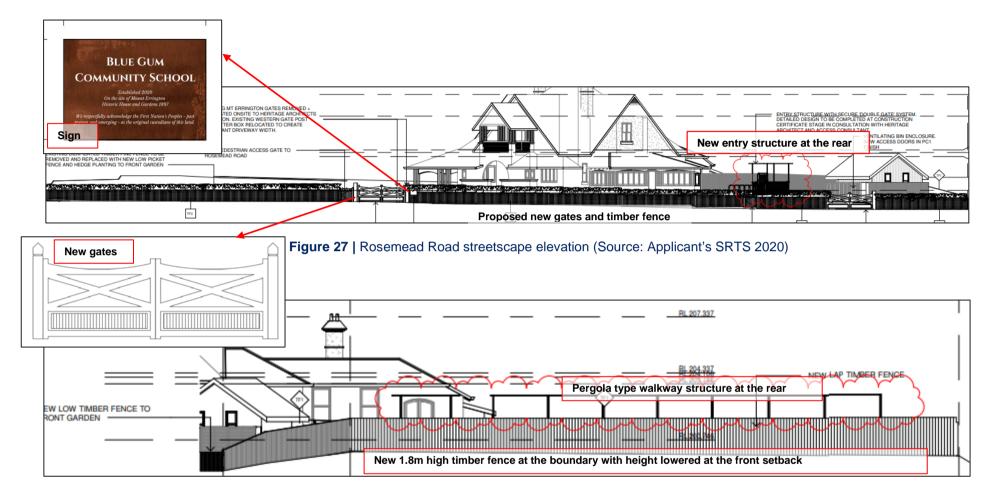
| Western boundary elevation as viewed from 1A Rosemead Road (Source: Applicant's SRTS 2020)
